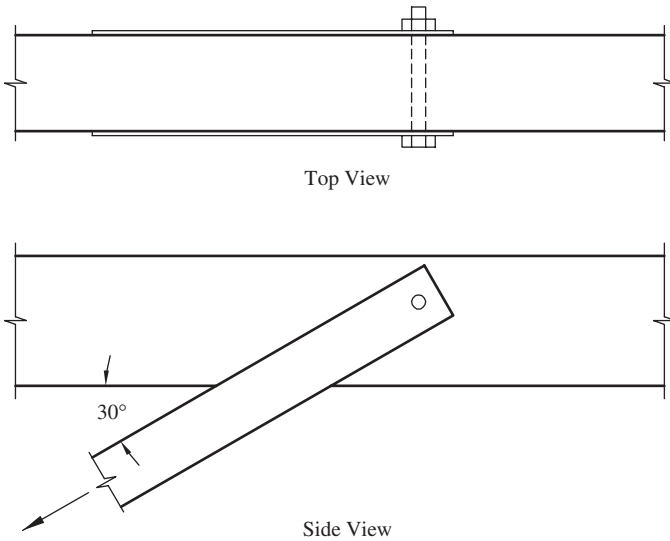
Tension splice connection—Example 13.2.6-2.
